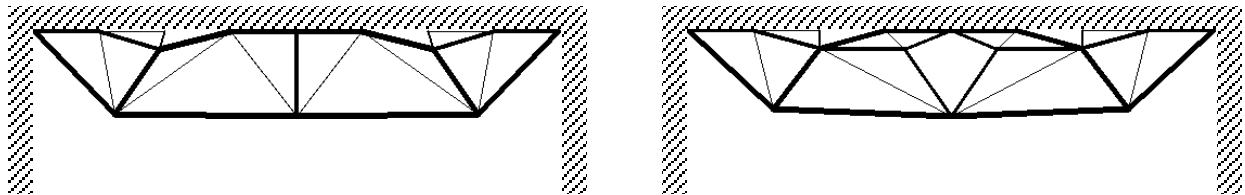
Symmetric truss layout for 7 fixed load points and depth = 1/6 span
